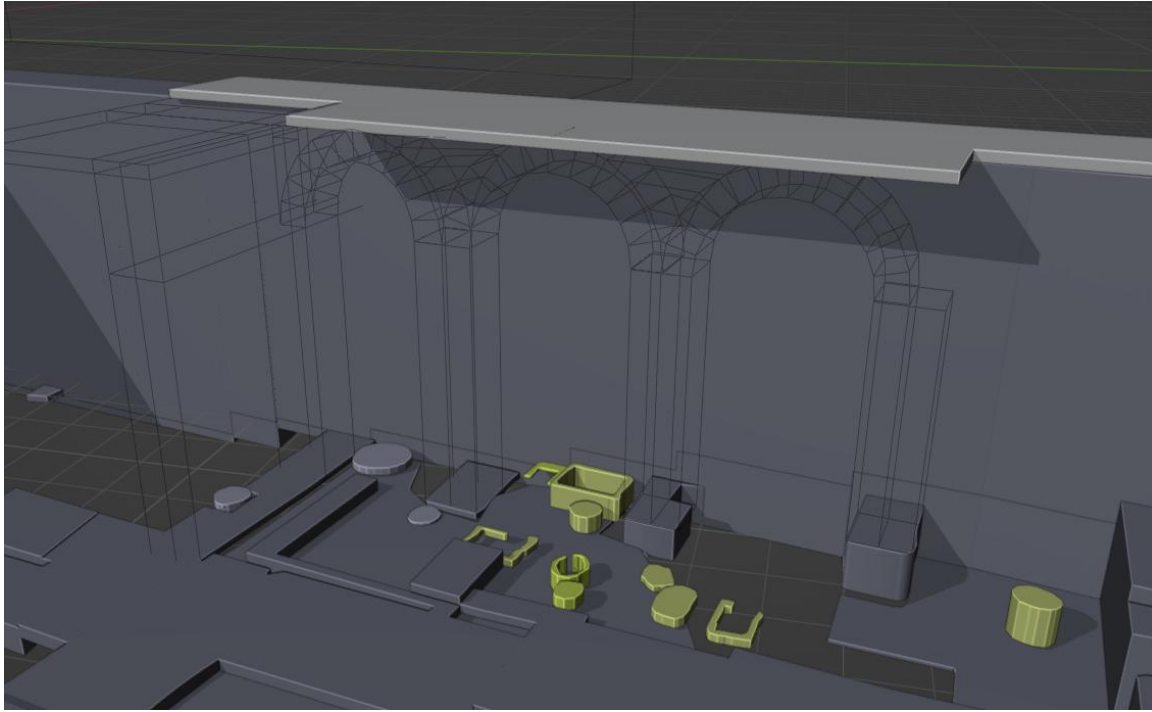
Alternative reconstruction option: extended surface supported by arched pier supported section..
